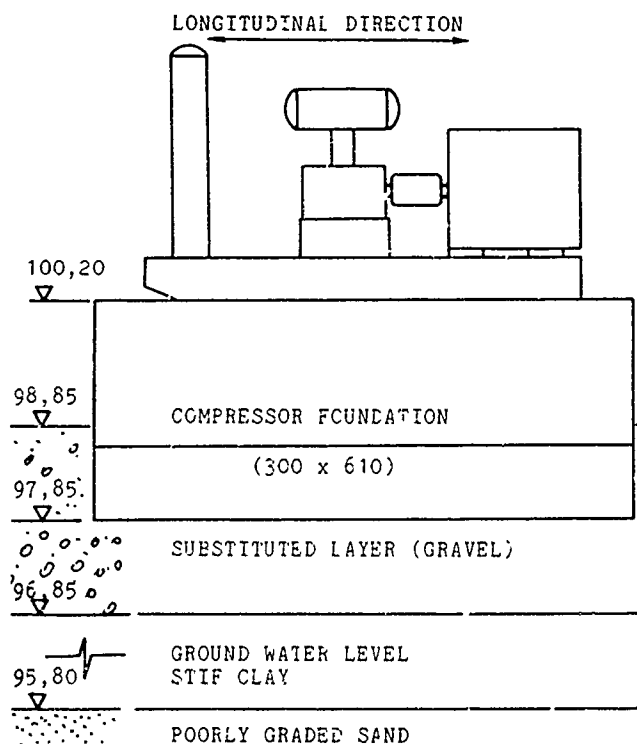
Cross-section of soil and foundation in C.S. Bokšić
